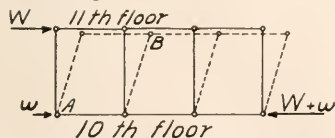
Frame with Hinged Joints. Vertical forces not shown.
